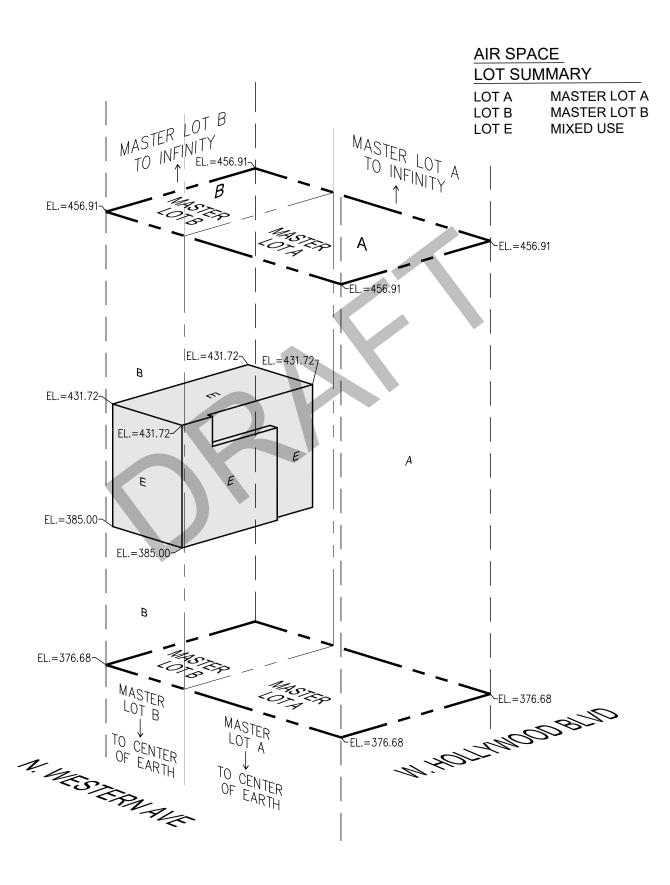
# EXHIBIT AIR SPACE LOTS (MAYER BUILDING) - SECTION VIEW
